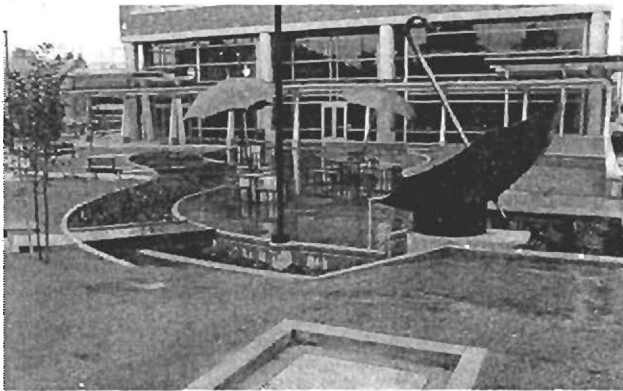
D.1.B: An open space which incorporates stormwater infiltration facilities.
